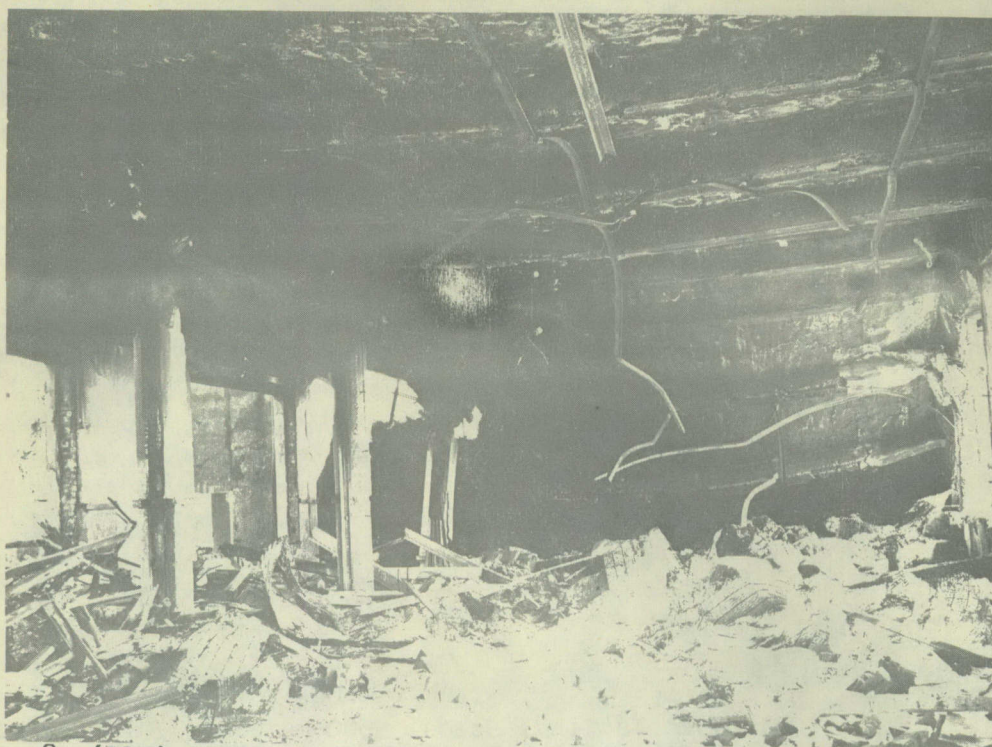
(11N). Shiroyama National School, 500 meters. Interior view, 3rd floor of the south wing, showing the collapsed roof. There were no survivors among the 66 people who were on the 3rd floor. (Photo File # NB 315.)
